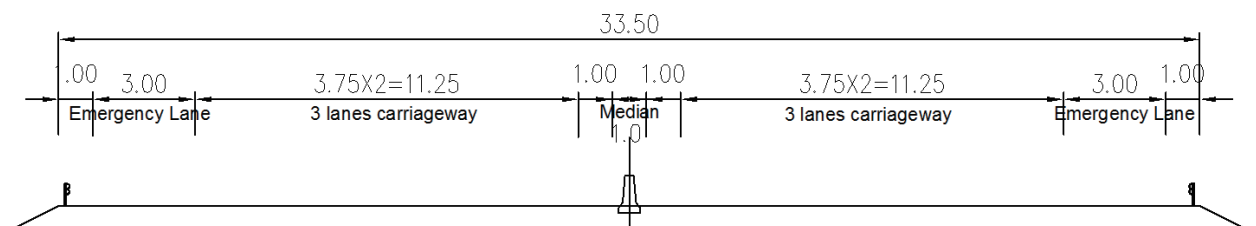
Width of Plan (Phase2:6-lane)
